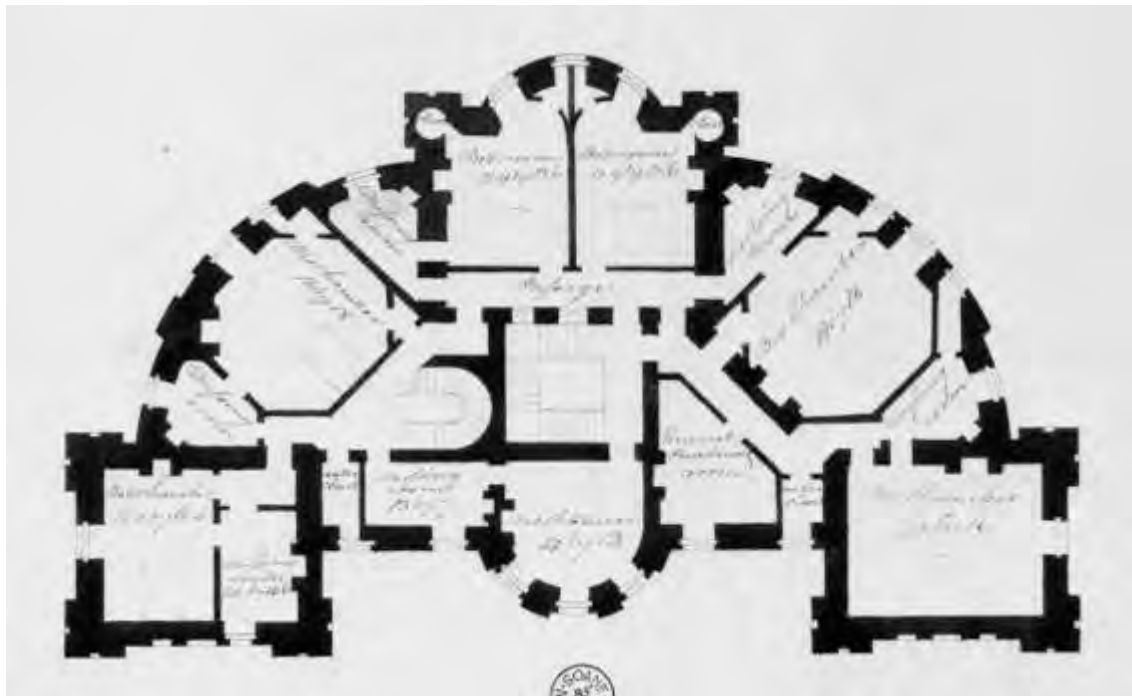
Plan of bedroom floor, Robert Adam c1791 *SJSM
